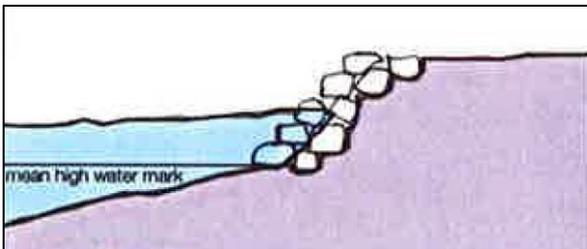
f: Seawalls should mediate in plan between adjoining conditions. At no point should a seawall create a physical step in plan. (l)
